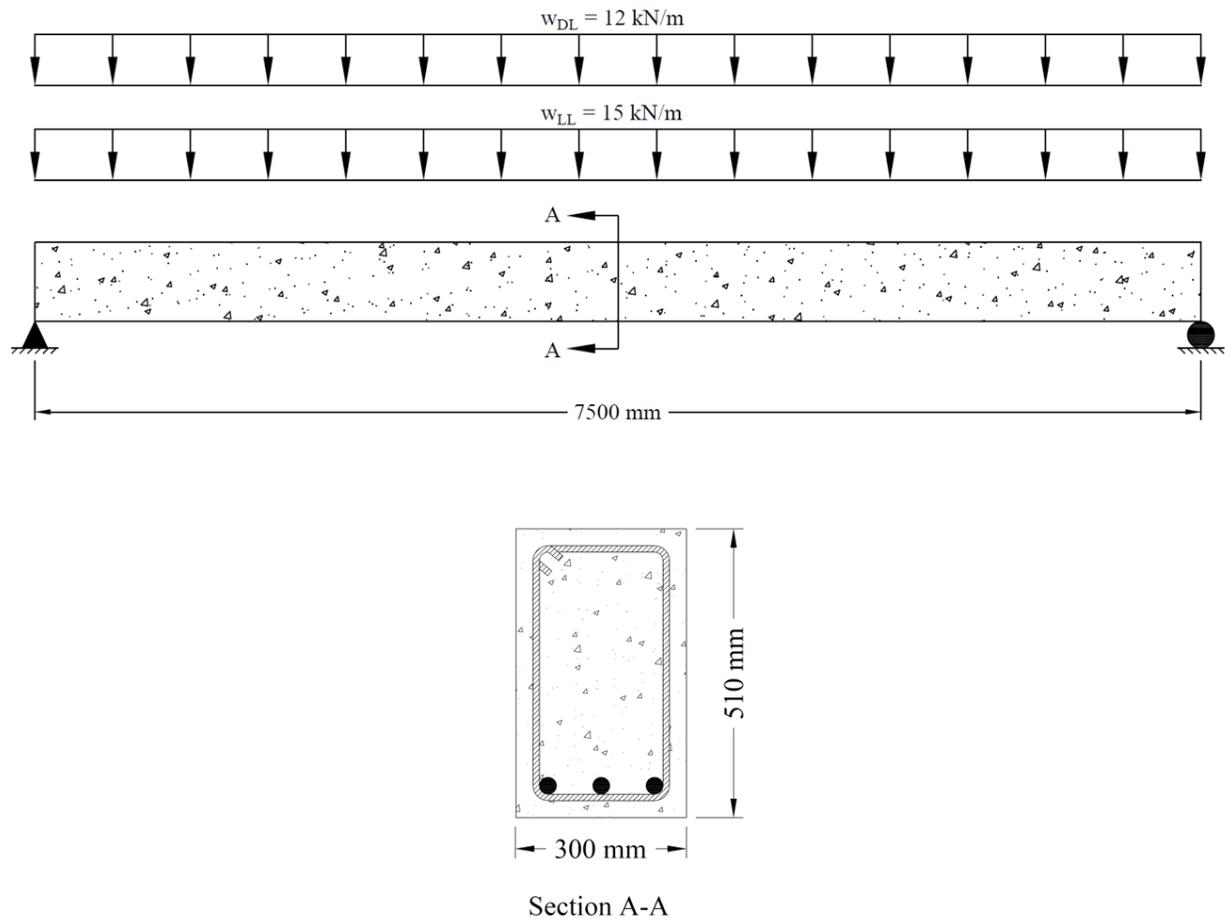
Rectangular Simply Supported Reinforced Concrete Beam
